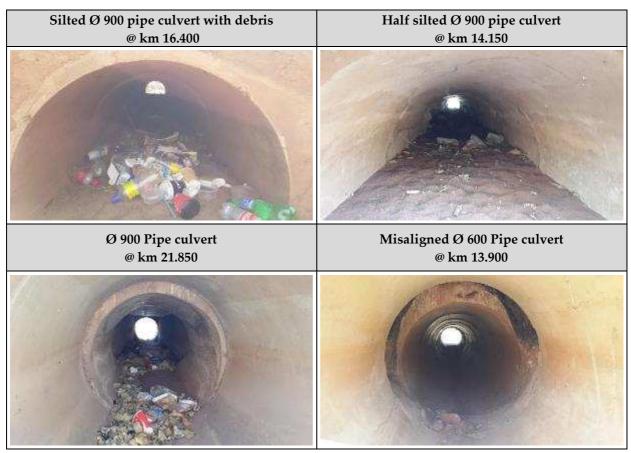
Blocked and misaligned pipe culvert barrels.
